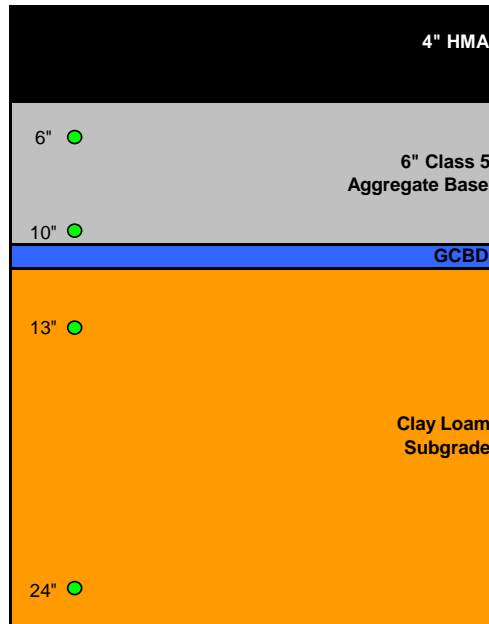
Cross-section showing instrumentation depth in typical vertical section through cell 27.
